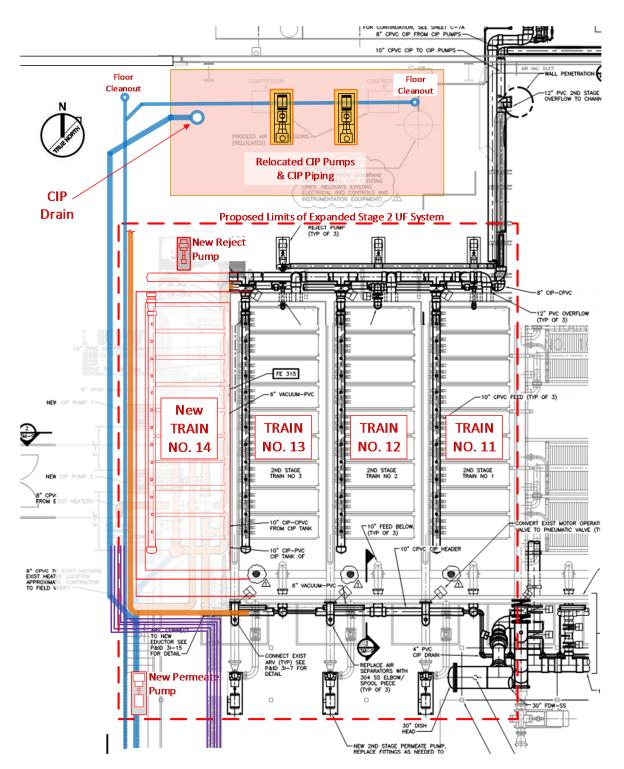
Proposed Stage 2 Expansion (Fourth Train), Lower Plan View
